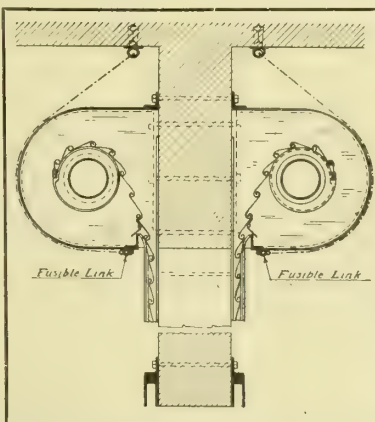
FIRE WALL DOOR FOR VERTICAL SHAFTS, FIRE WALLS, CORRIDORS OR ROOM PARTITIONS
